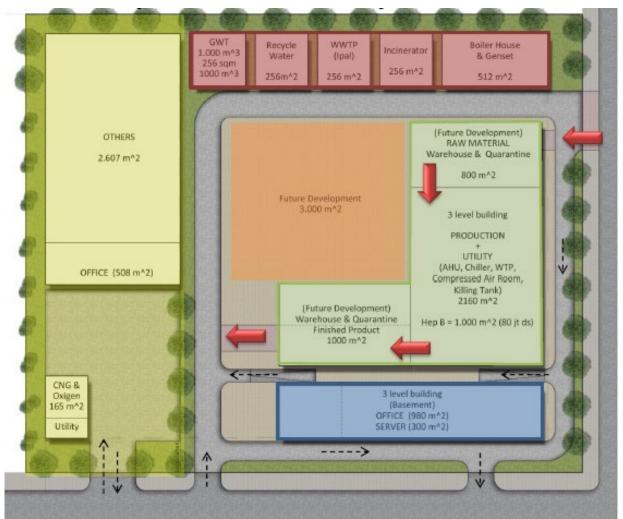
Site plan of Bio Farma's planned facility in Indotaisei, Karawang Regency
